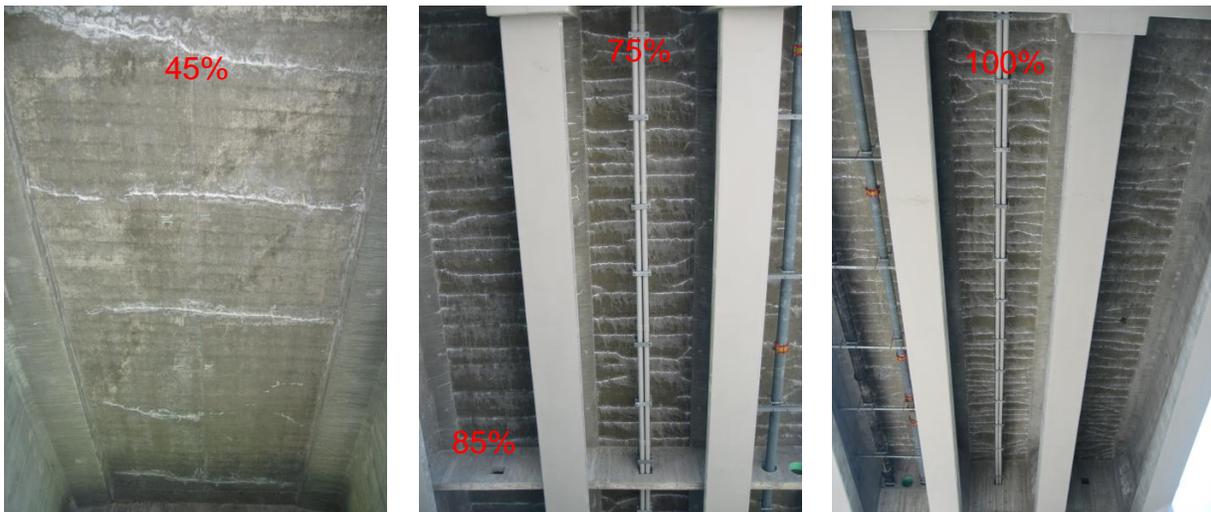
Range of Deck Cracking for Bridge 303/4A
